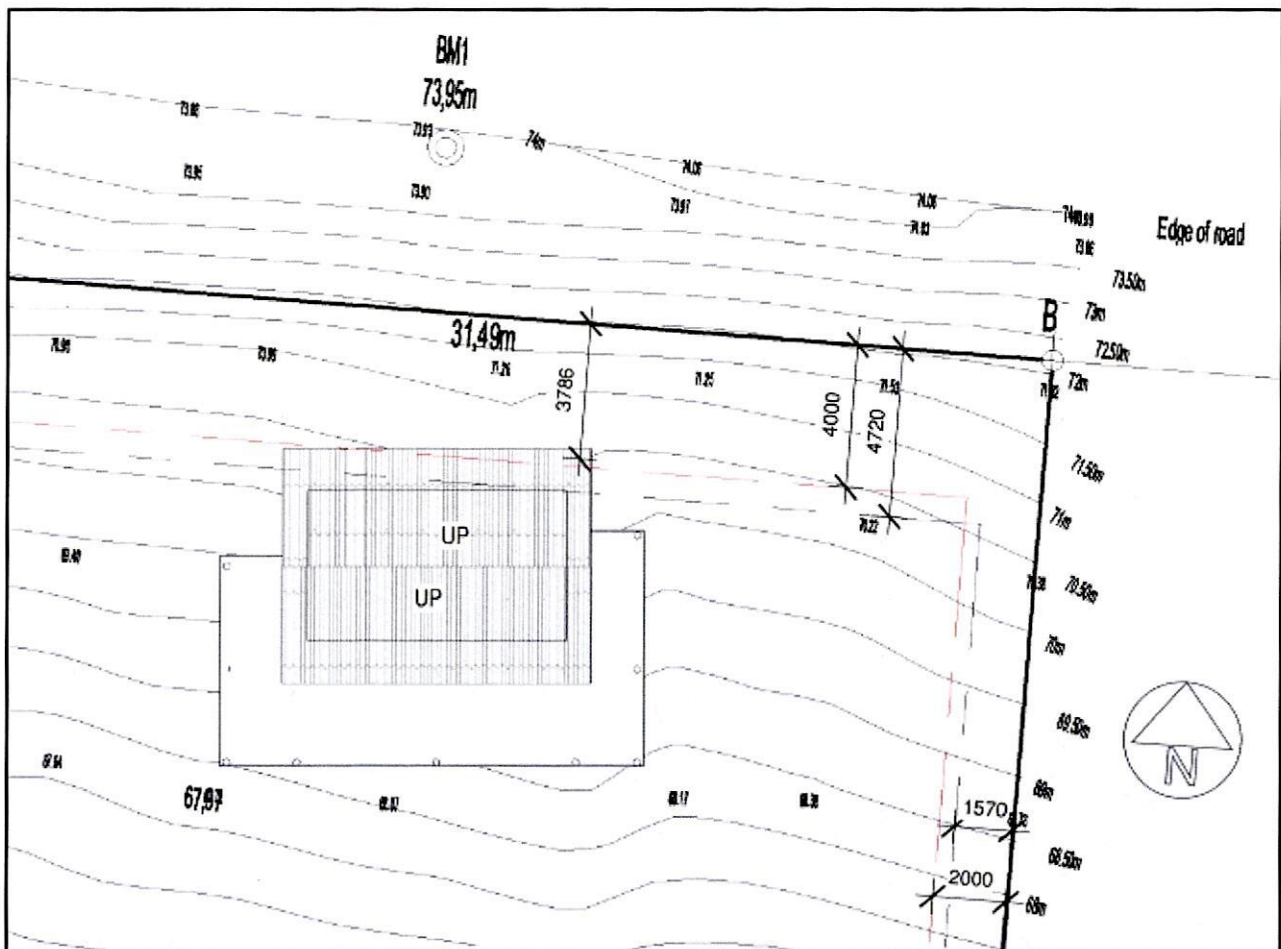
Extract from the proposed building plan, Plan no.: BB3109/21
